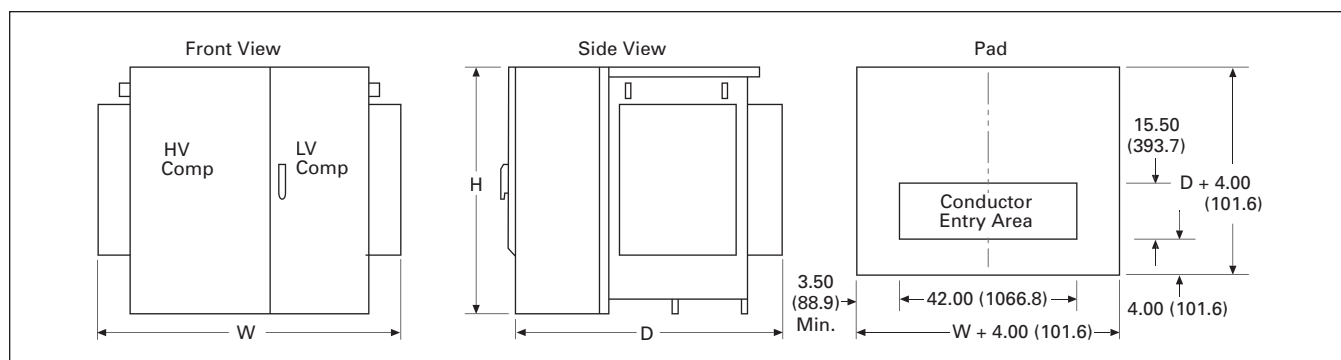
Pad-Mounted Transformer (75–2500 kVA)—Dimensions in Inches (mm)
